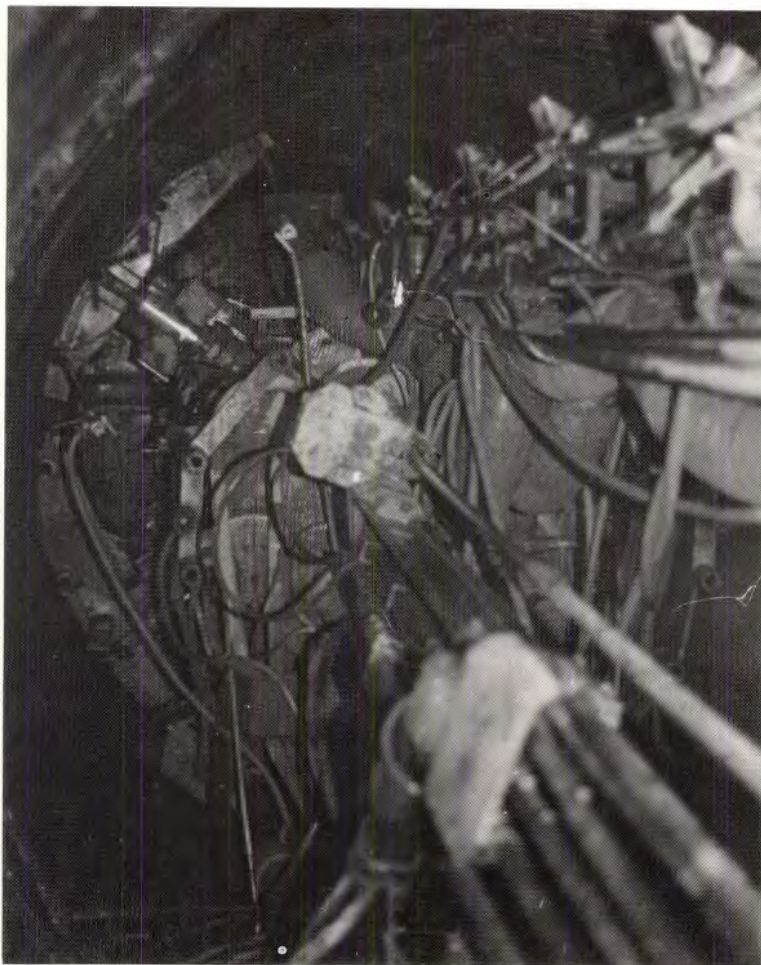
Hydraulic drill mounted on Wirth TBM
